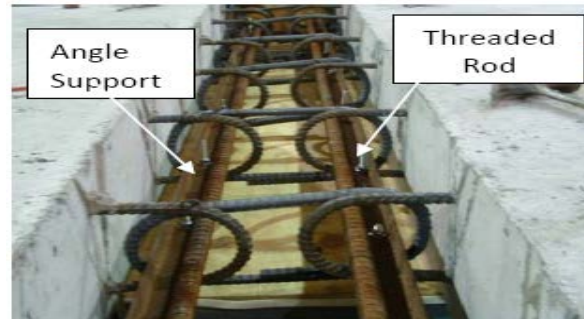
A Typical Reinforcing Bar Joint before Grouting (Swenty 2009)
